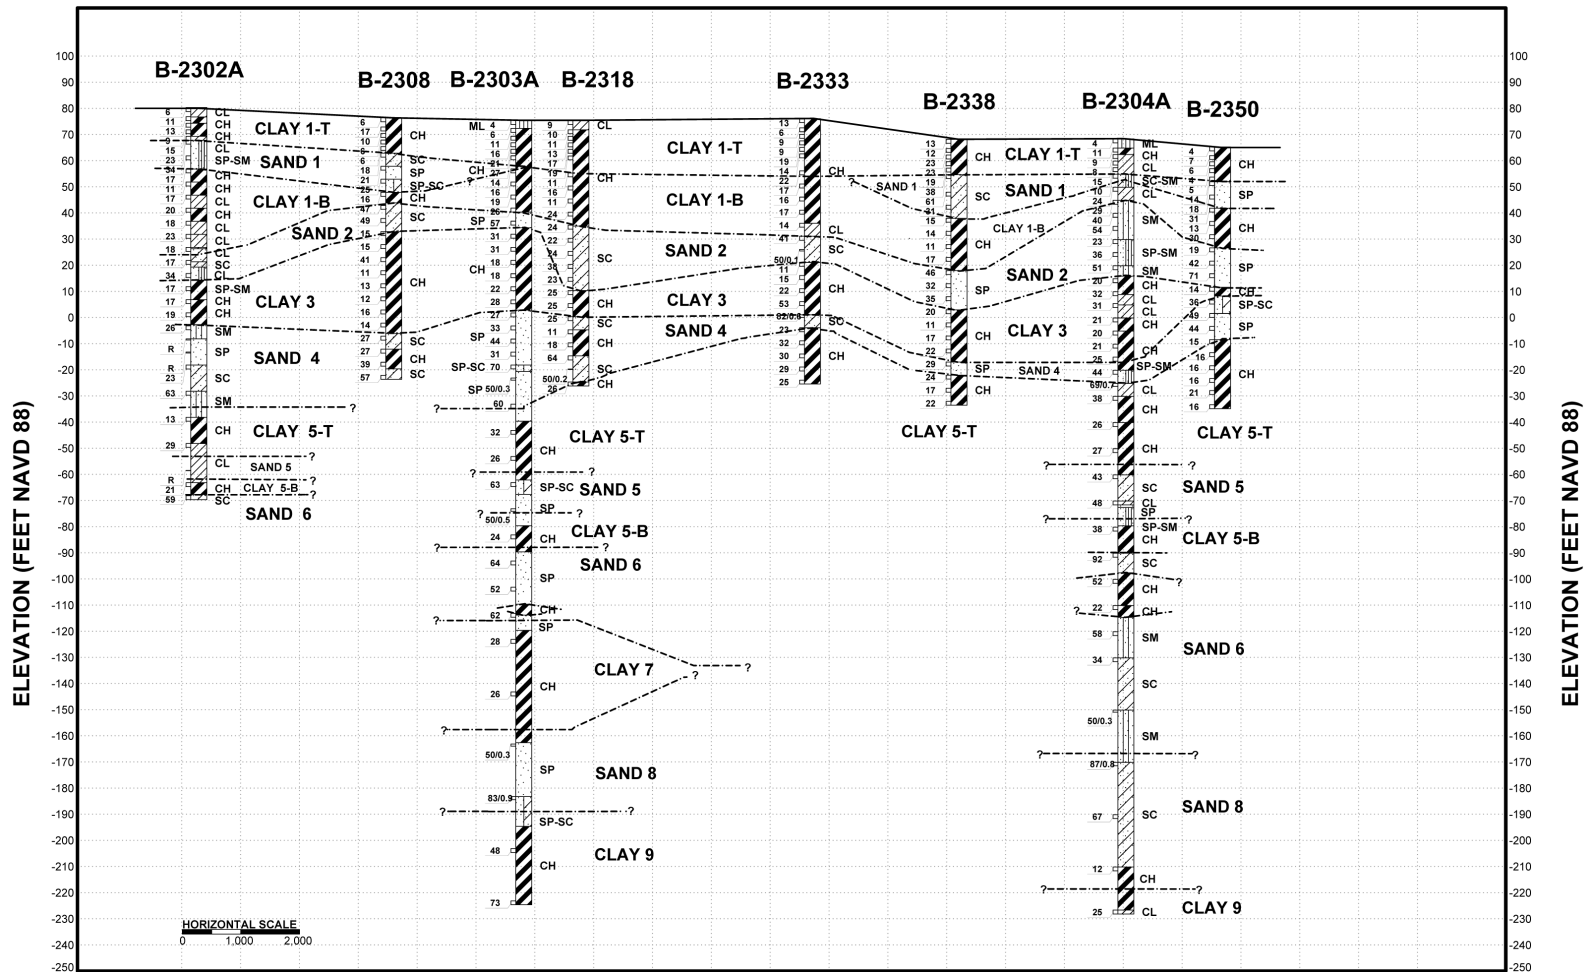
Subsurface Profile Plan E; West Embankment Dam of Cooling Basin (North-South) (Cooling Basin)
